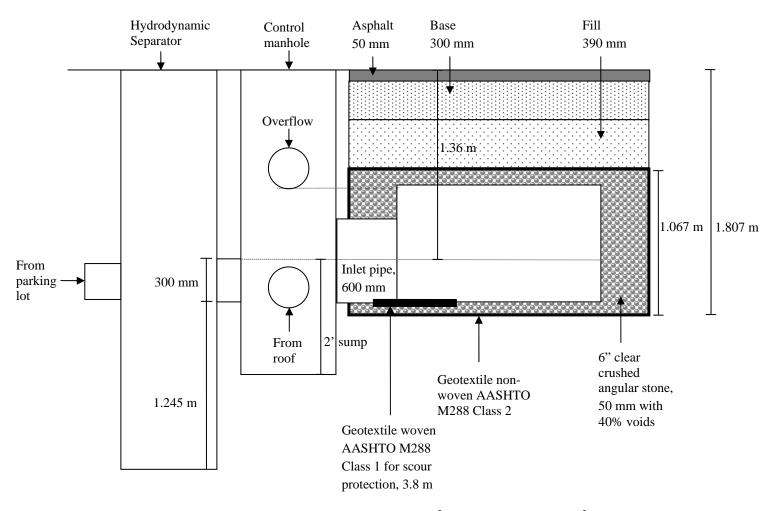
Cross section of infiltration chambers receiving road (1500 m²) and roof runoff (500 m²)
